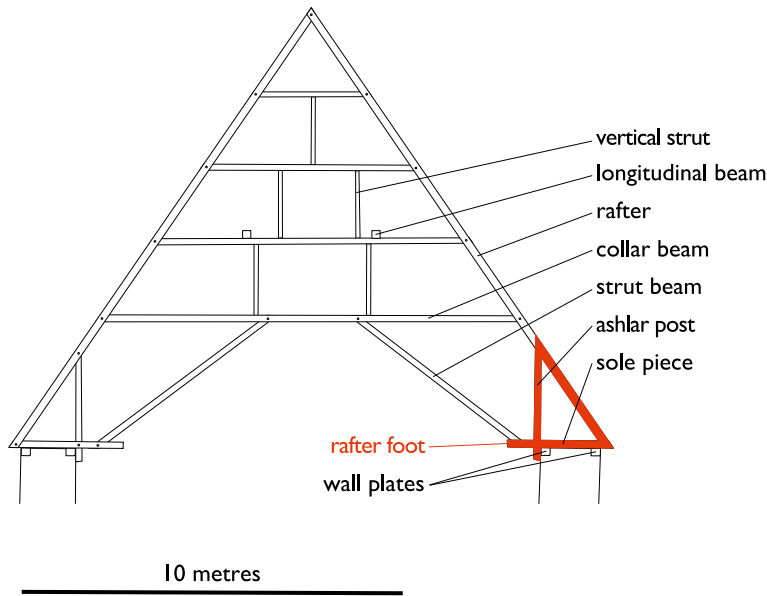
The roof structure of Sipoo church, cross-section (ca. 1454d)
